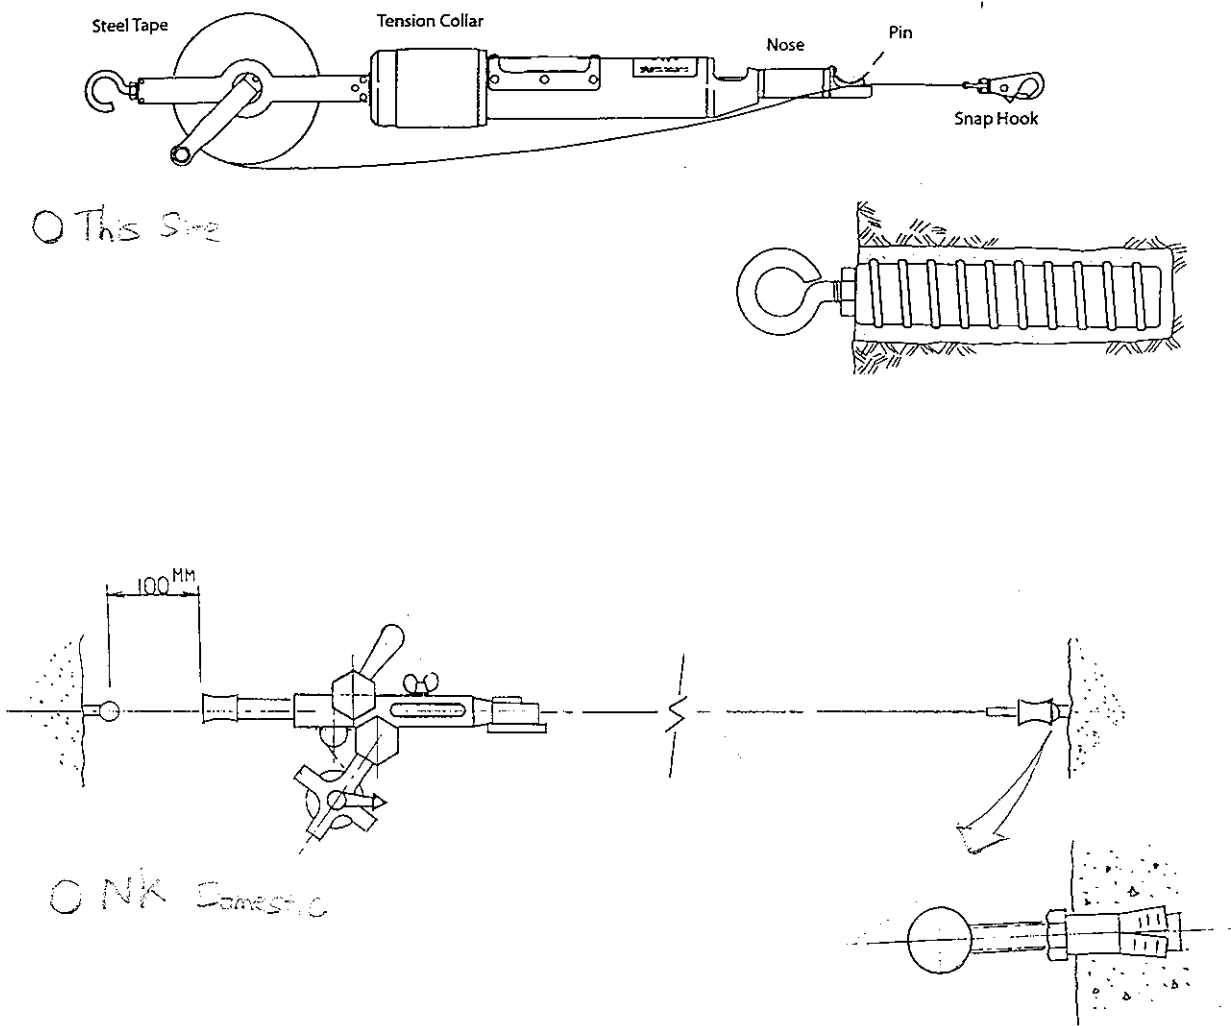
Measurement Equipment for Reduction Distance between Tunnel Walls
